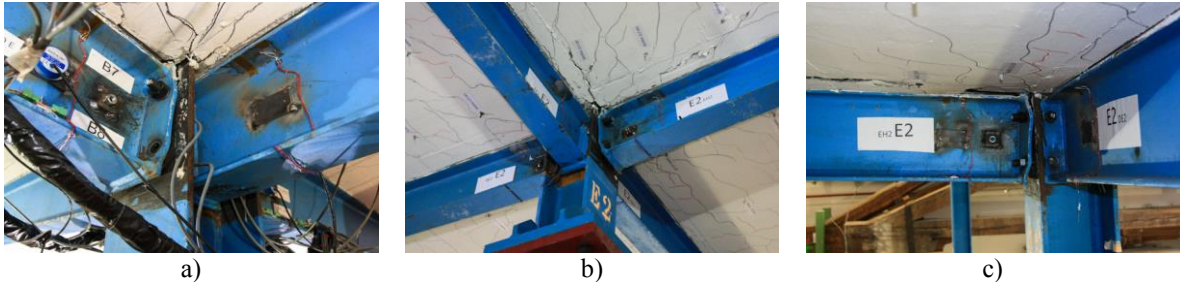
Deformation at column's collapse: the central joint (Asymmetric configuration)
